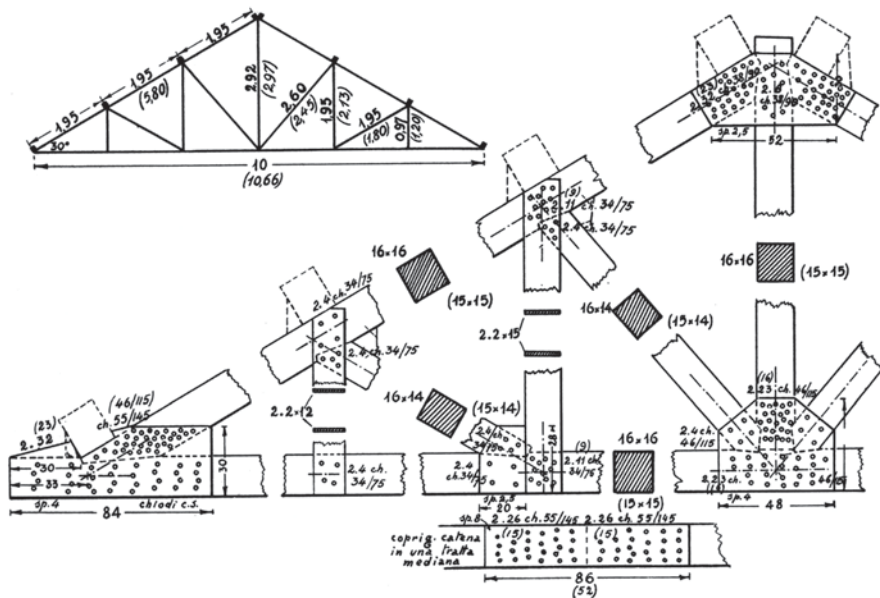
Timber truss that reproduces the structural schemes of Howe truss, originally used for steel constructions. (Giordano 1947)
